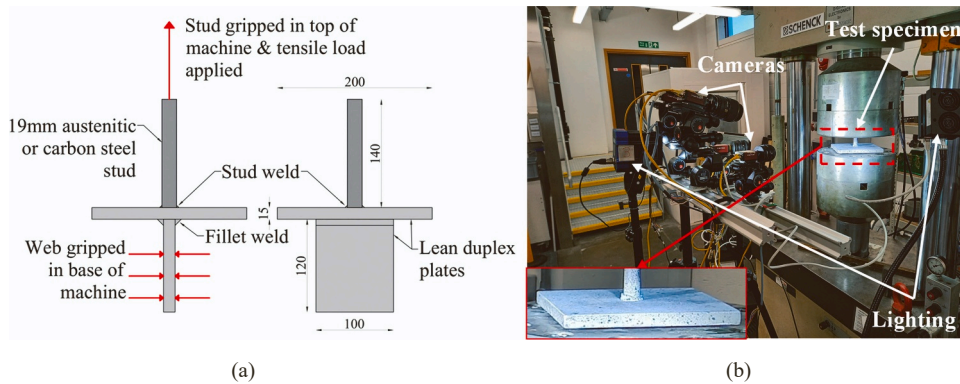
(a) Diagram of welded stud specimens including dimensions in mm and loading; (b) Welded specimen test setup and measurement arrangement.
